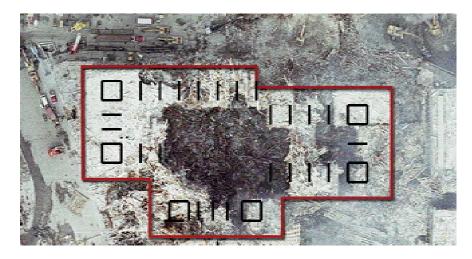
Collapse of World Trade Center 6, induced by falling debris from the North Tower. Note that the dark lines indicate approximate locations of one-bay steel moment frames around building perimeter.
